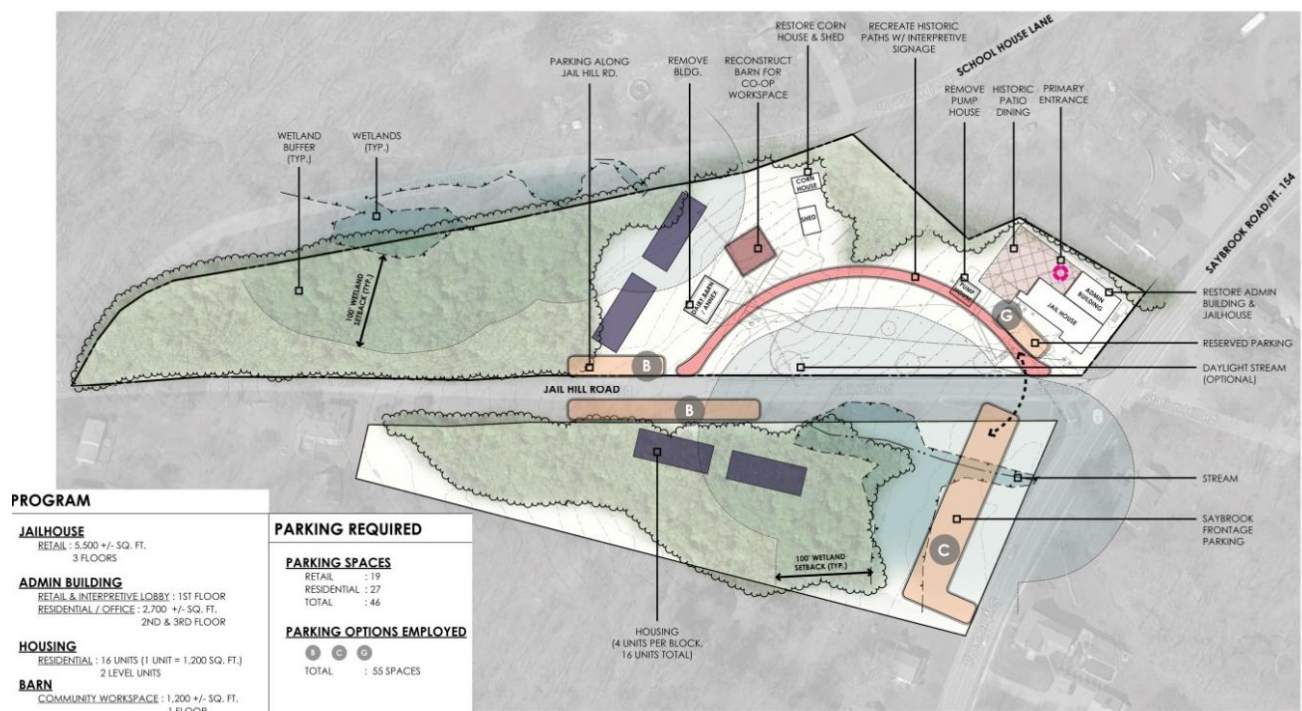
PRELIMINARY ALTERNATIVE #3 RETAIL SITE DIAGRAM
